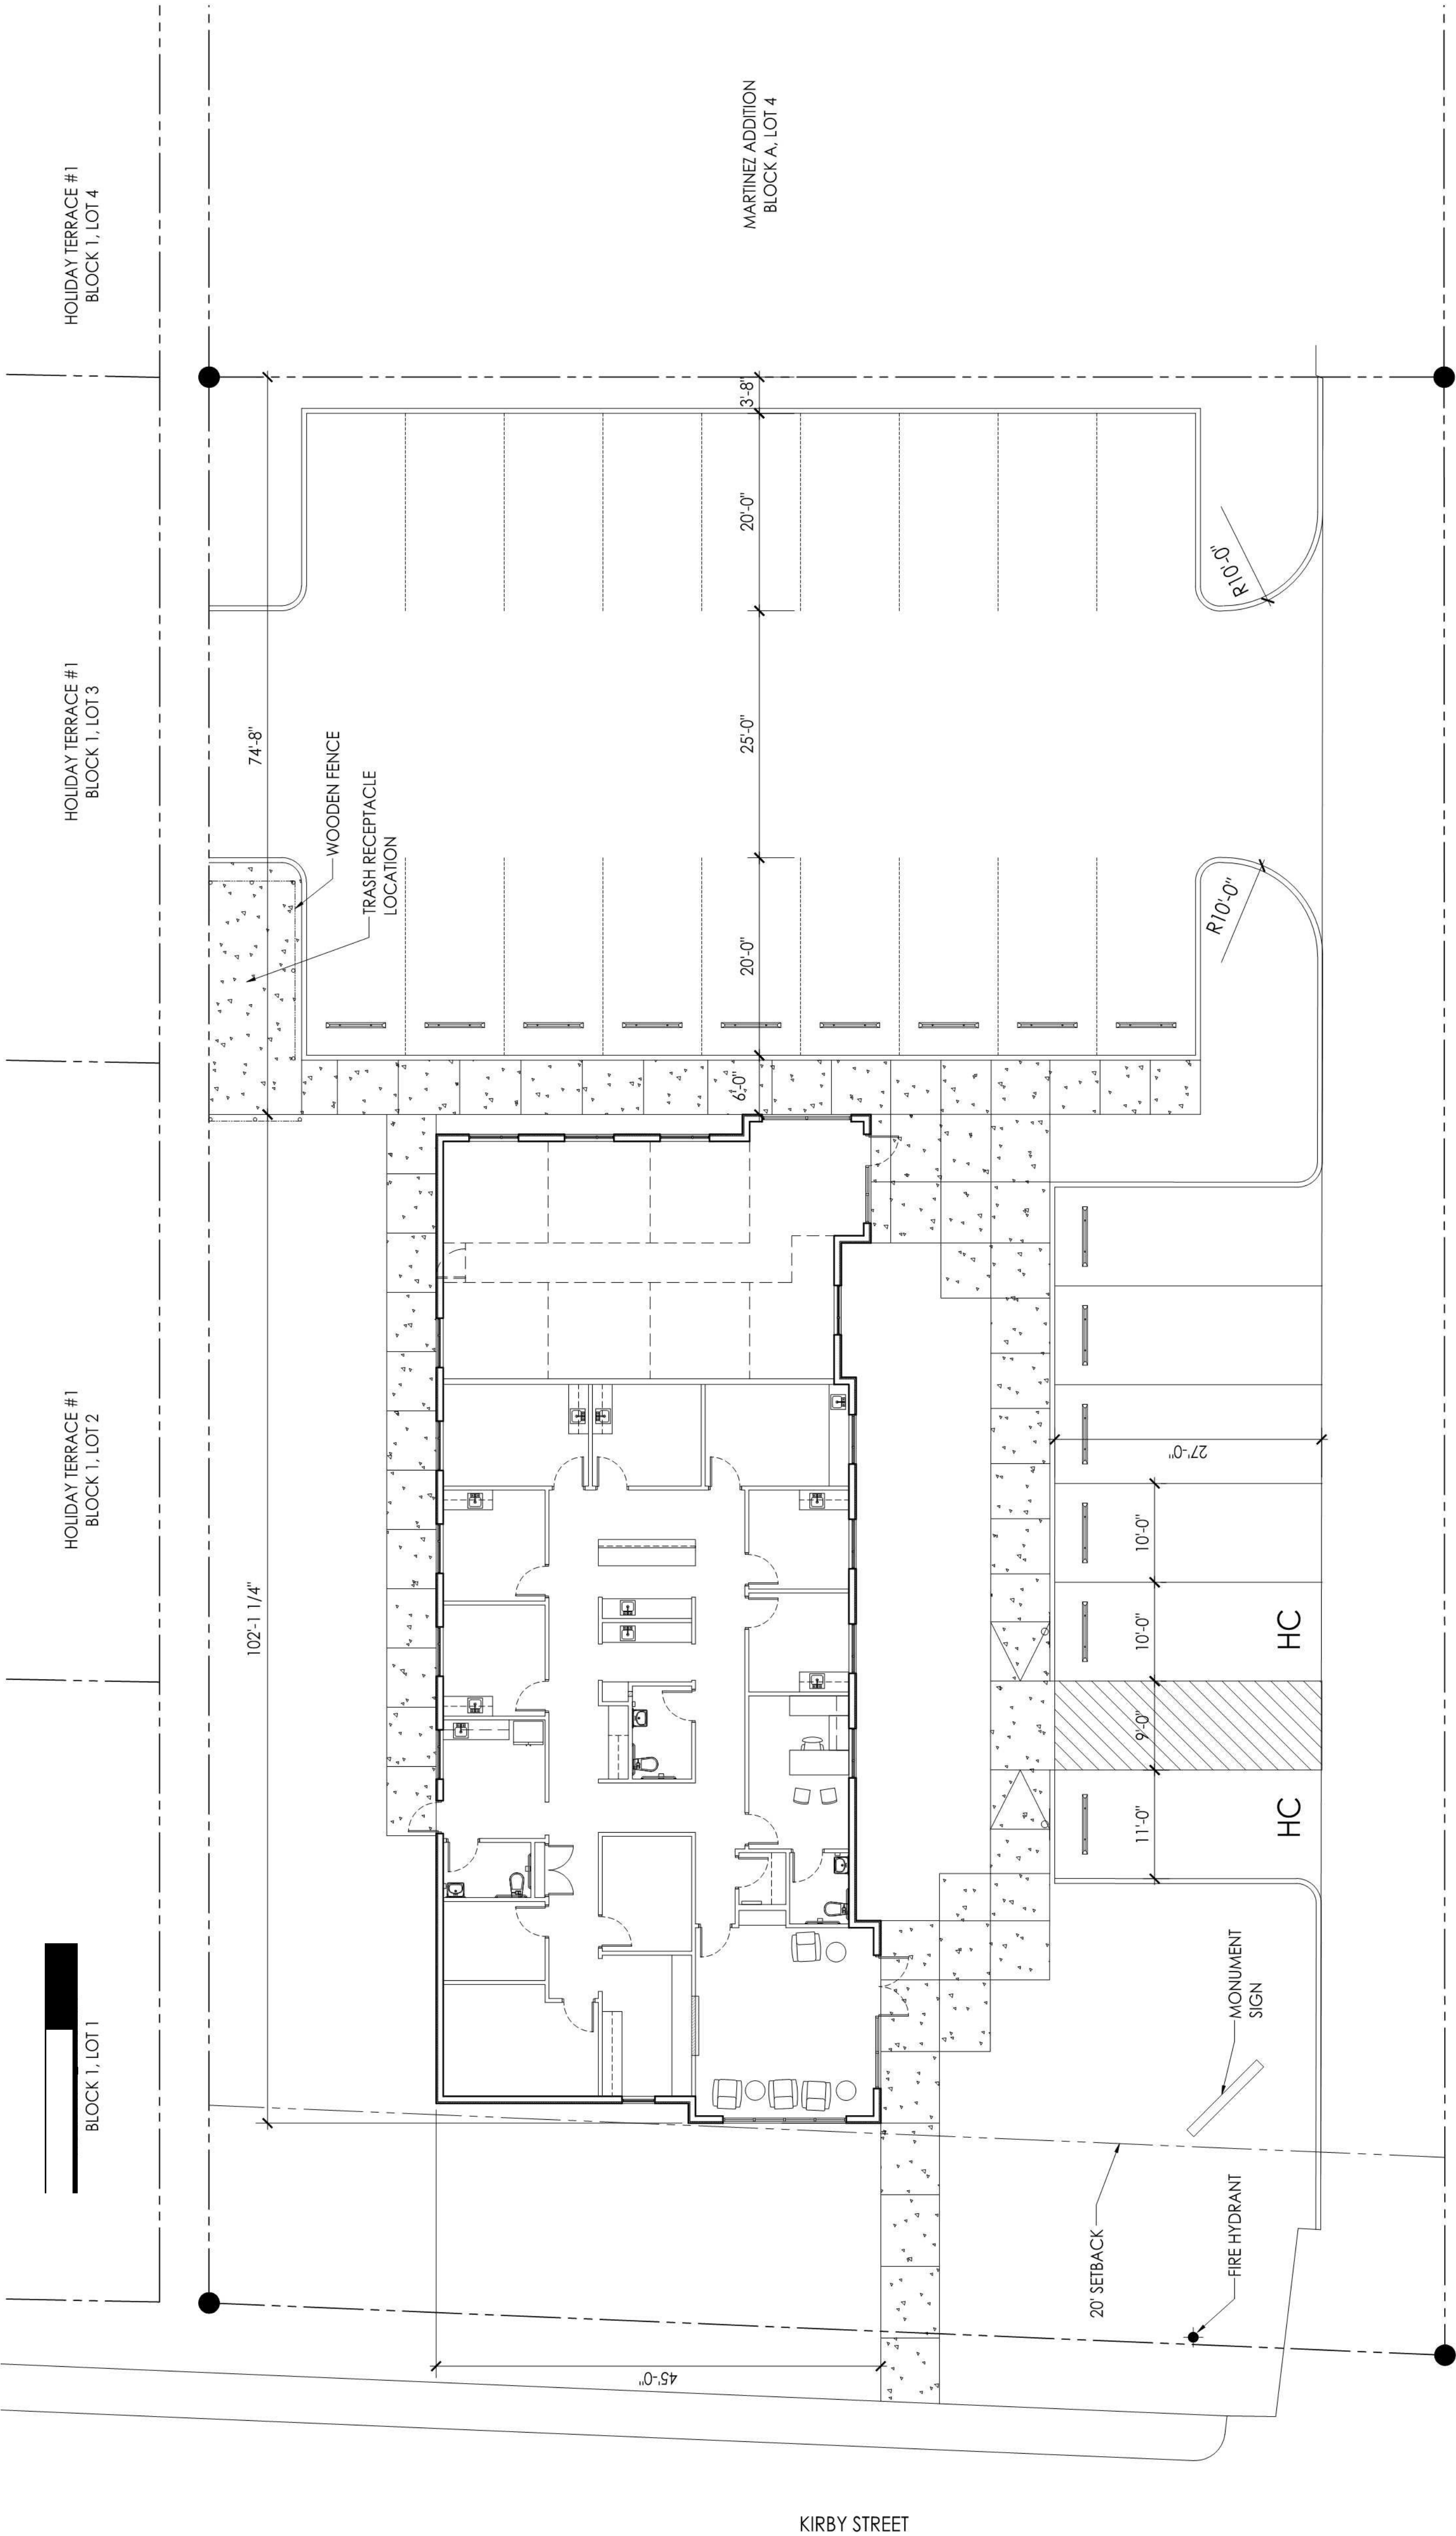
SITE DESIGN REQUIREMENTS
